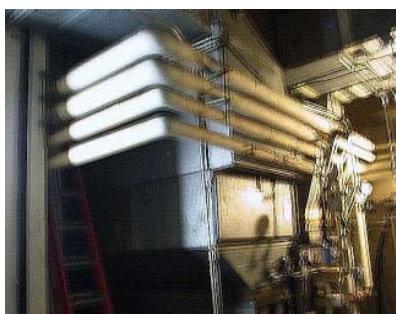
Example of no seismic bracing on the piping or the duct work.
